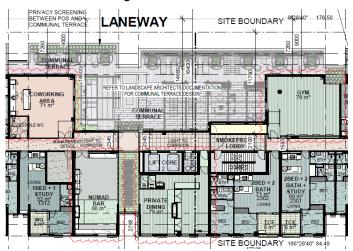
Communal spaces in PLN16/0922 – 1-57 Wellington Street & 71-77 Victoria Parade, Collingwood
